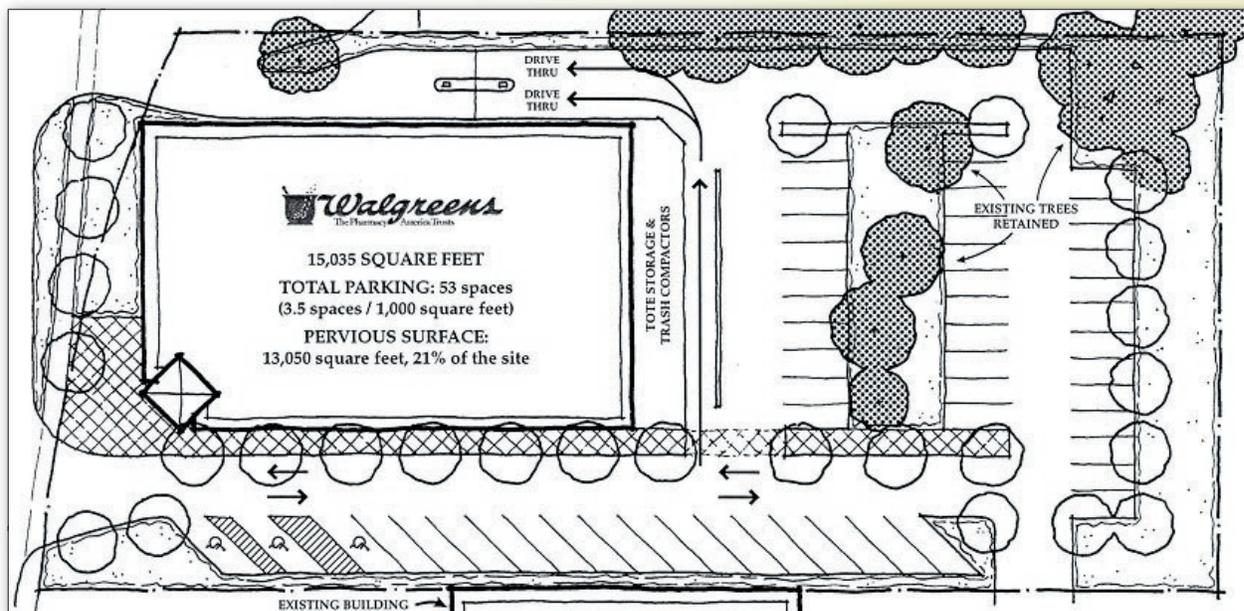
Street fronting pedestrian-friendly drugstore layout
